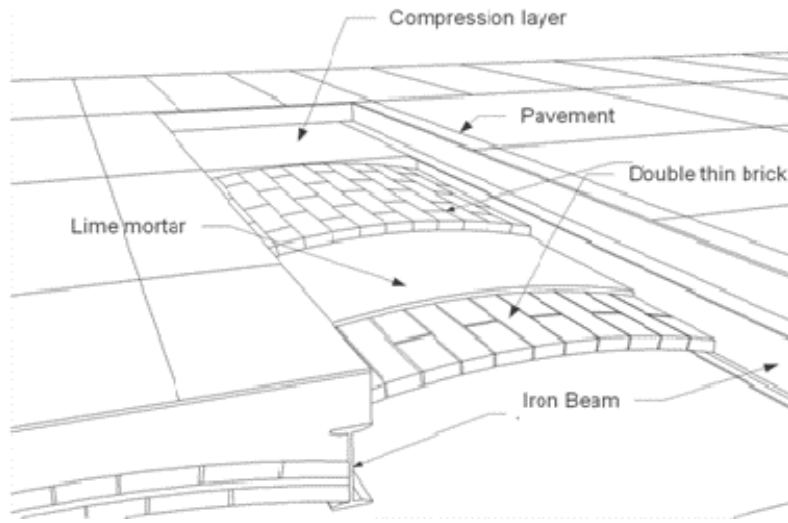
Details of a floor system observed during the demolition of an Eixample building.
